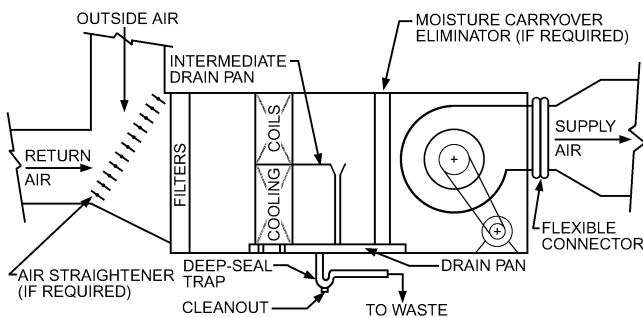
Typical Arrangement of Cooling Coil Assembly in Built-Up or Packaged Central Station Air Handler
